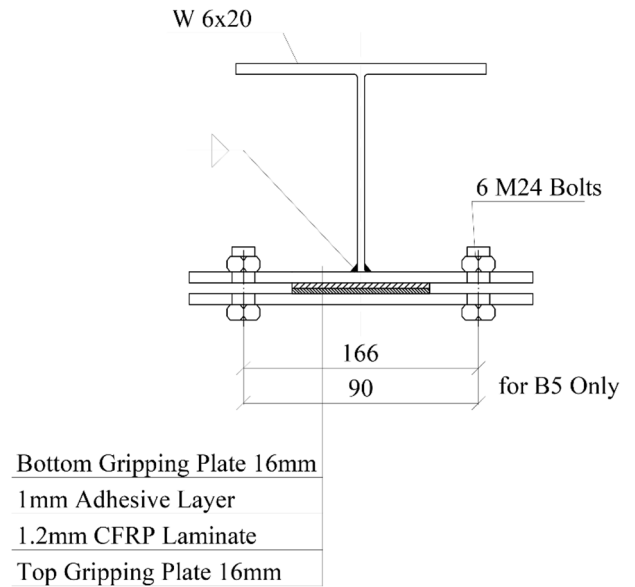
Strengthened steel beam's cross-section at the location of the gripping plates (Beams B3 and B4).
